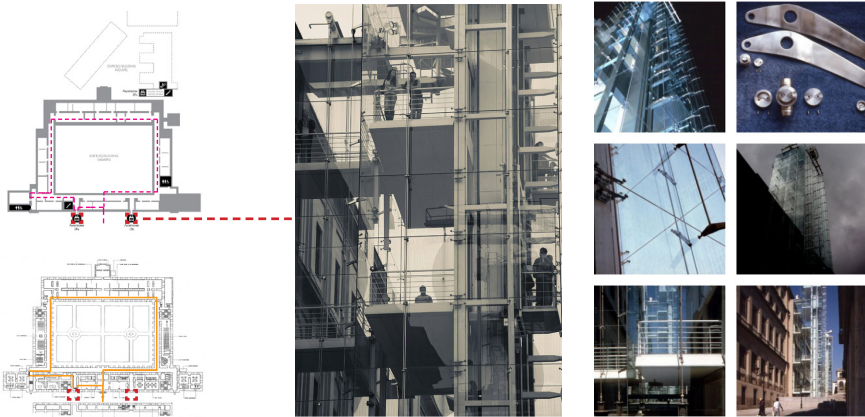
a) Museo floor plan with elevator areas; b) elevation of the glass volume elevator; c) details
